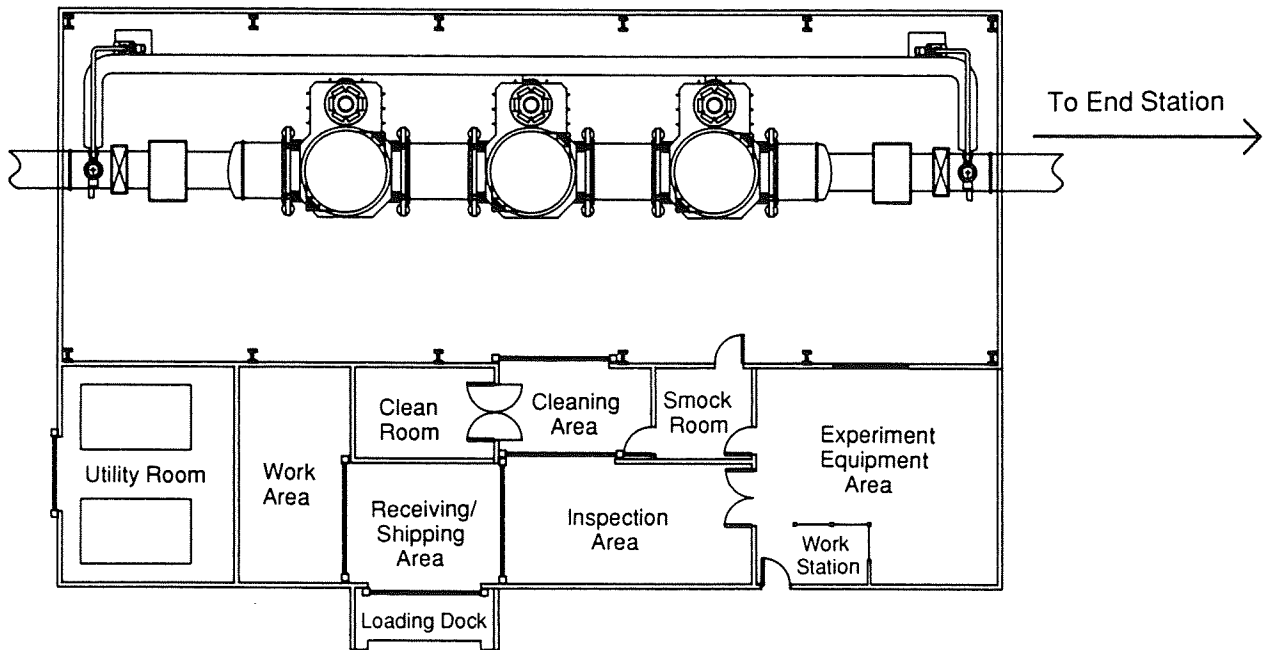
Floor plan of the right-arm mid station at Site 1, Phase C.
